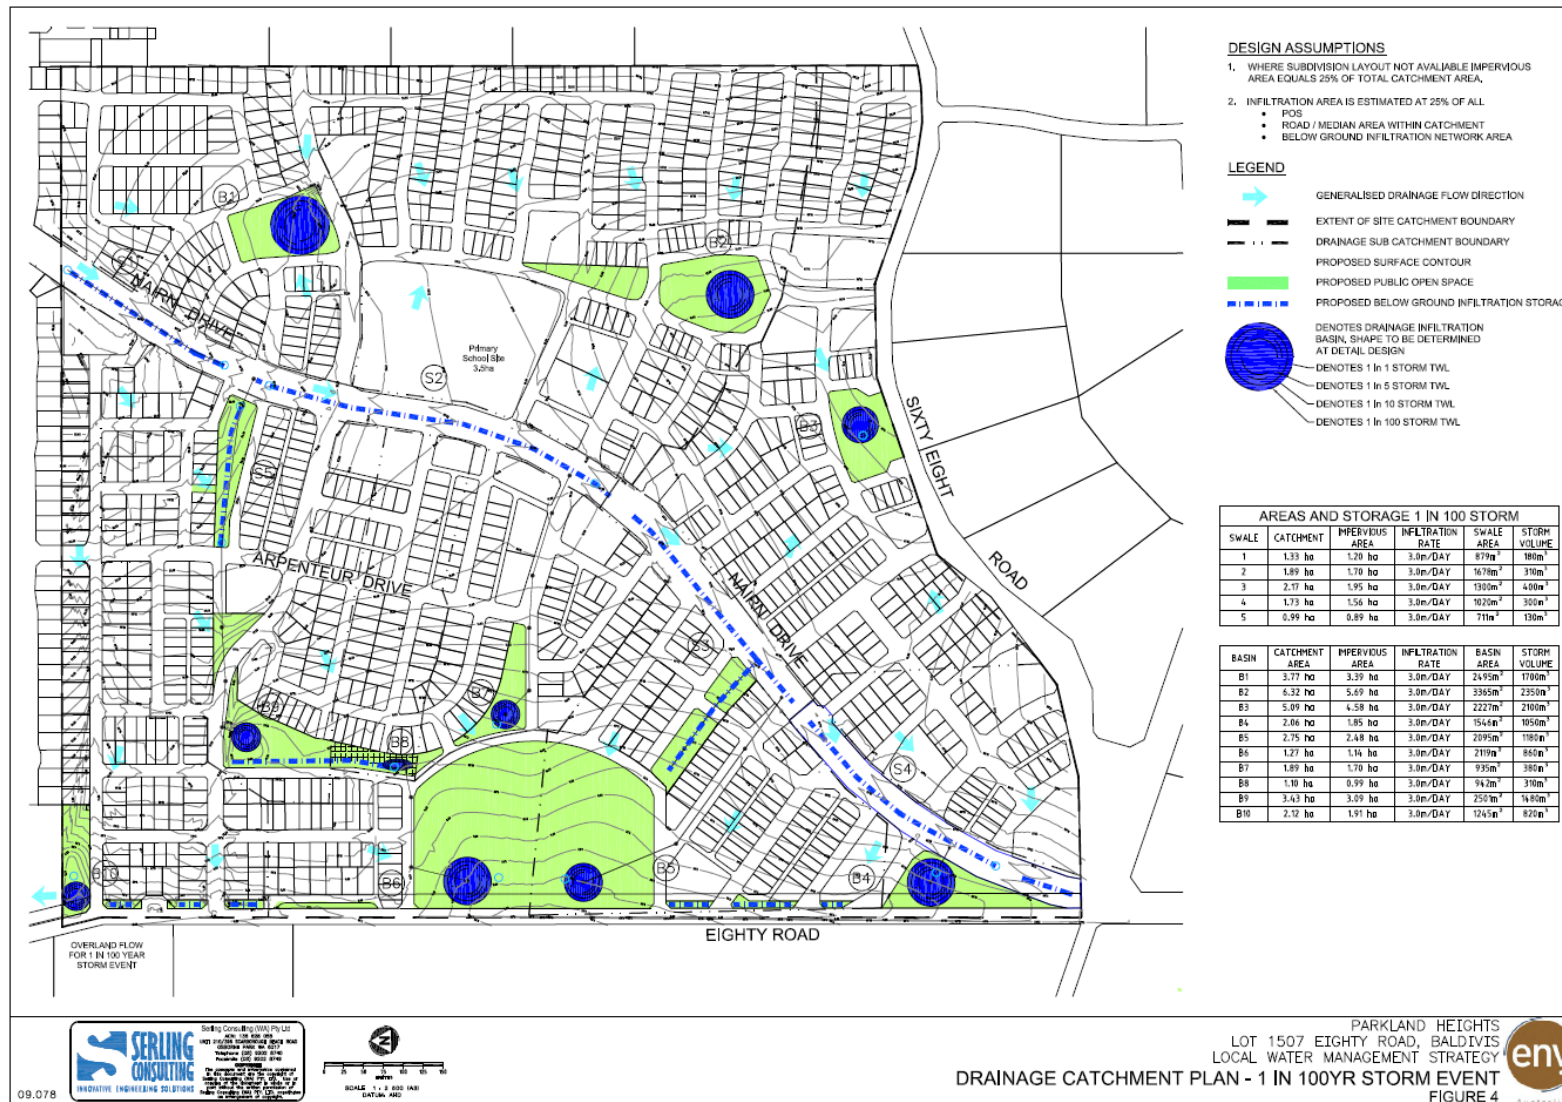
Stormwater plan proposed in the LWMS (ENV Australia 2011)
